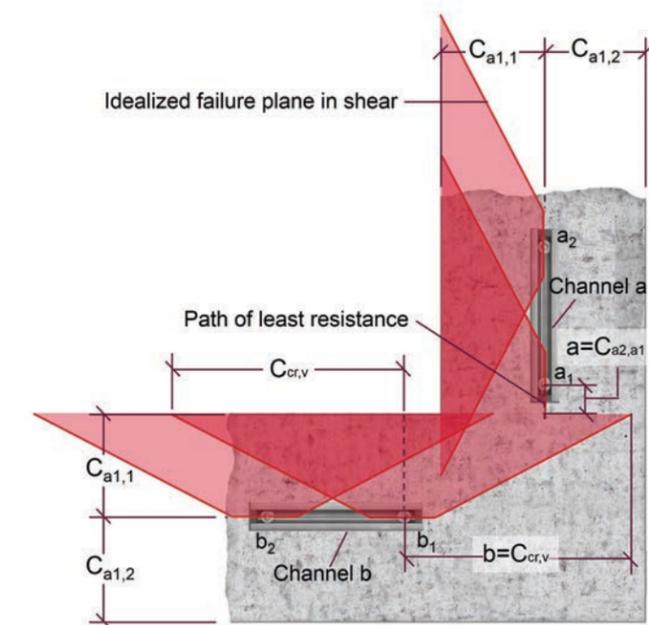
b — Inside Corner — Shear Perpendicular
